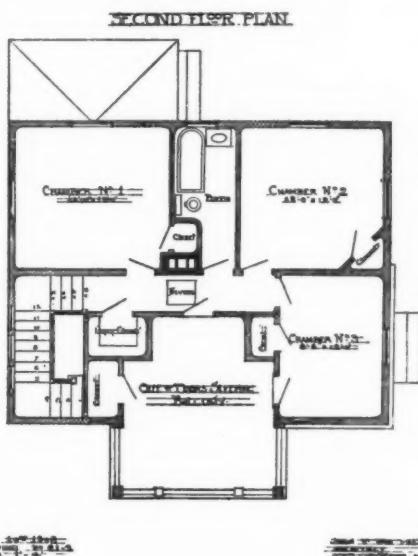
SECOND-FLOOR PLAN OF ECONOMICAL SANITARY HOUSE.
